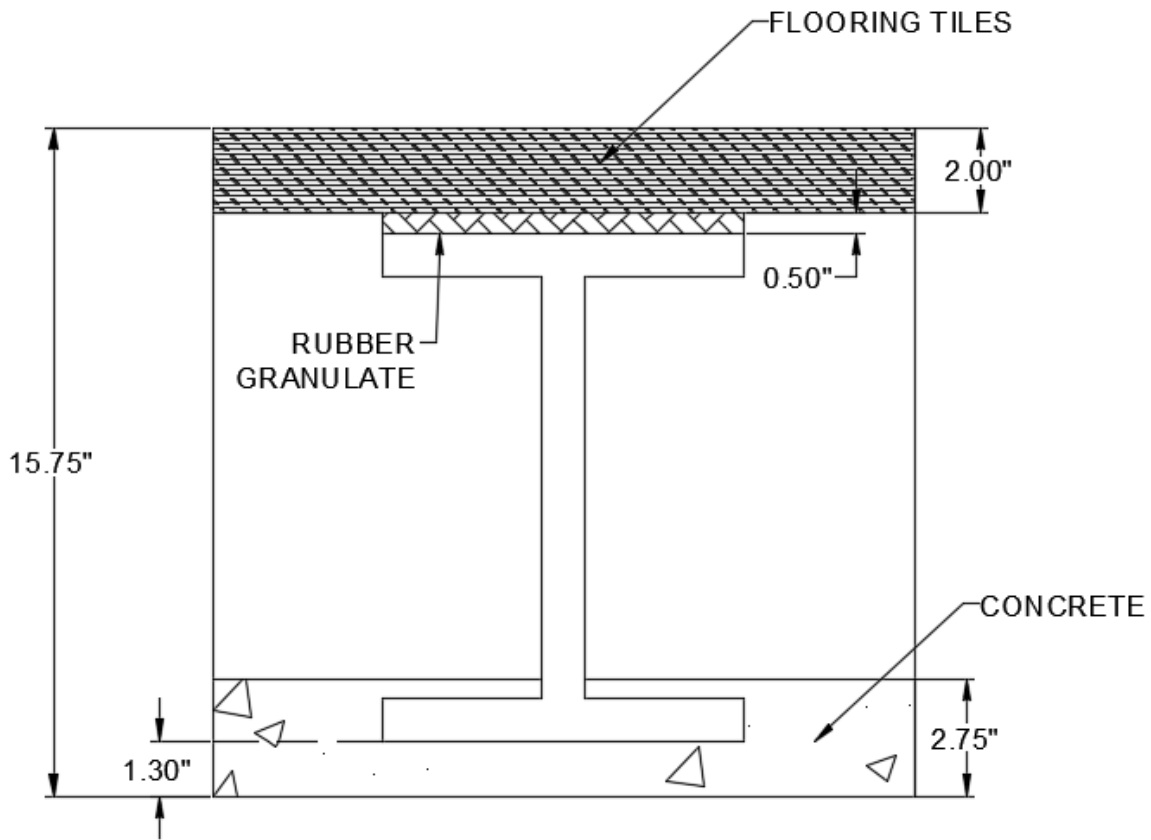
Slimline Floor Cross-Section with No Climate Tubes
